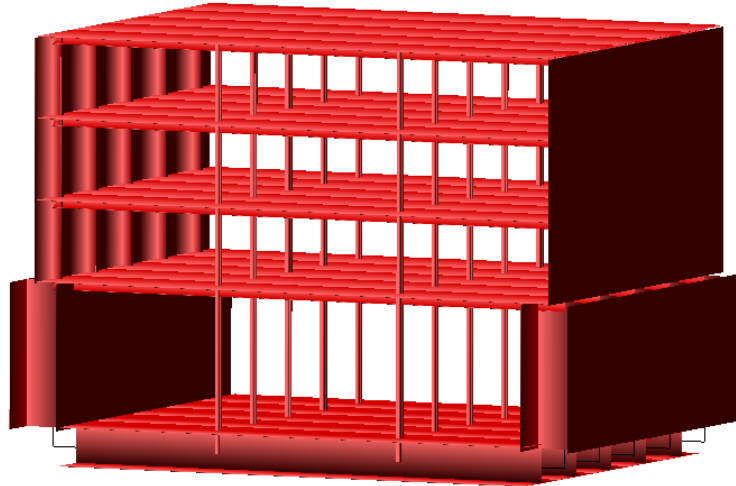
The arrangement for the girders drawn in 3D-Beam.
